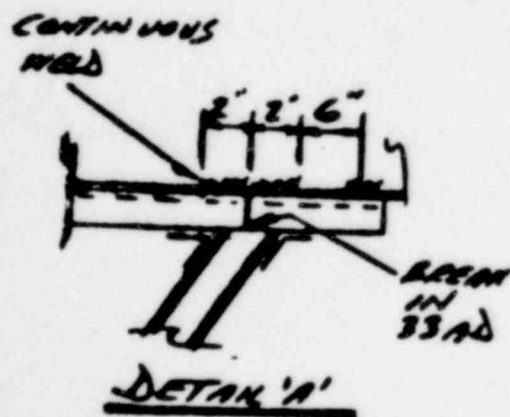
The typical cable tray configurations in this area are trapeze, cantilevered and pedestal supports. The cantilevered cable trays are two tiered, with each tier braced to embedded steel channel in the concrete wall. The pedestal supports are also braced to the wall at each tier.
